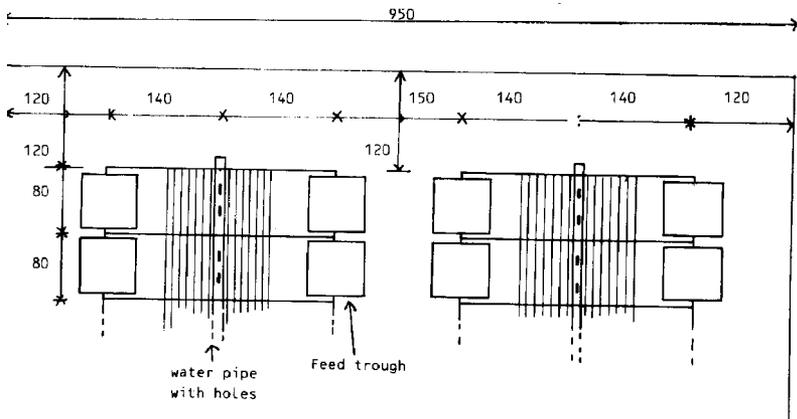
Cross-section of experimental pens for sheep and goats (in cm). An elevated floor with the slats made from wood may be a better arrangement.
